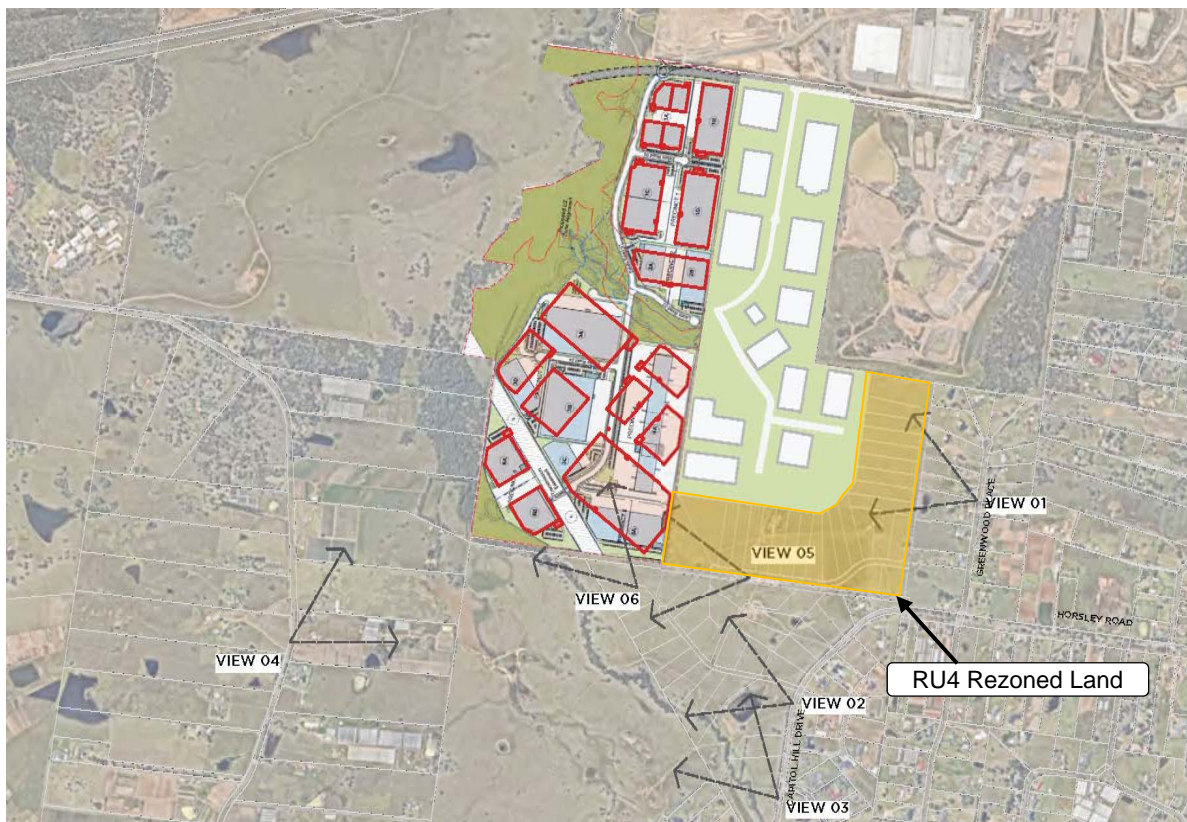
View Locations from Approved (Red Outlines) and Proposed Concept Proposal Layout
